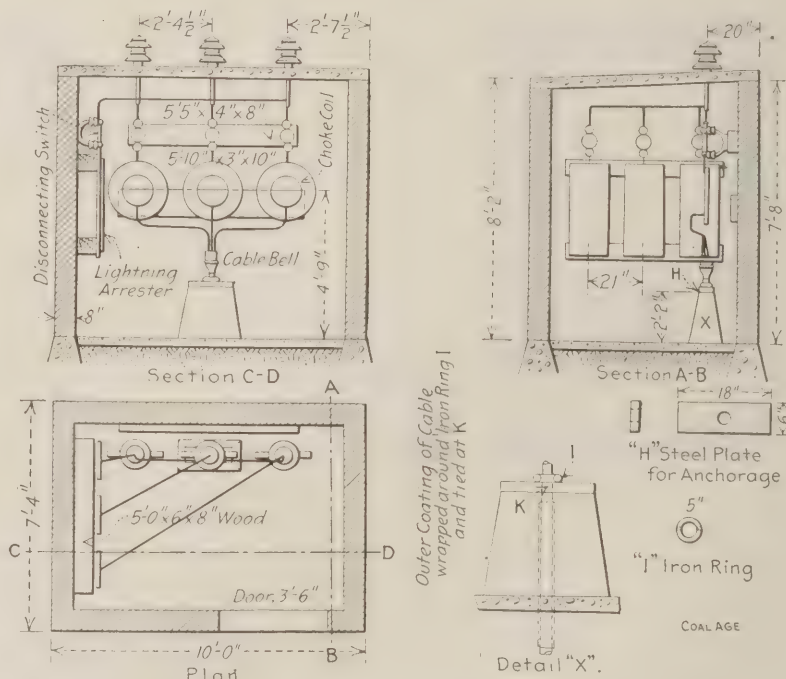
SHELTER OVER BORE HOLE AND DETAILS OF SUPPORT FOR HANGING CABLE
